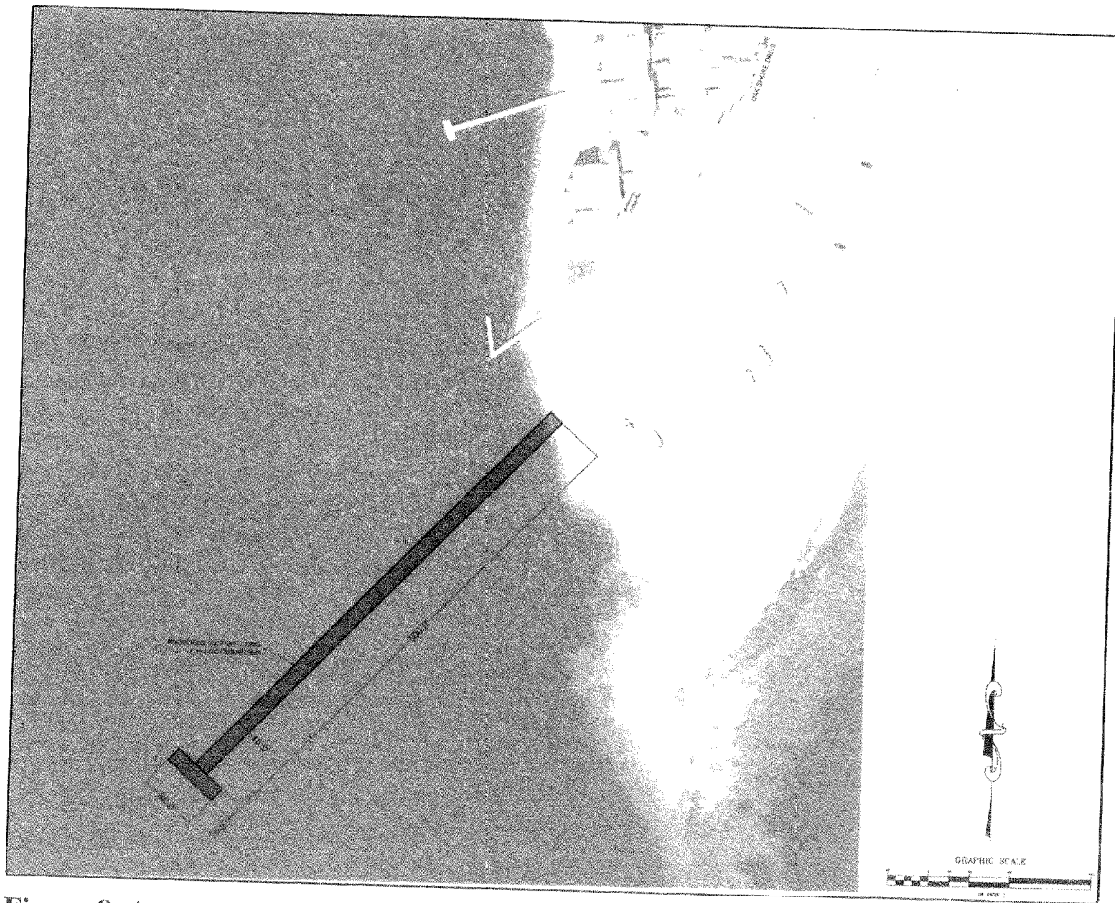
Approximate design location for the proposed Oak Shore Drive Pier. Earl Gilbert dock and ramp is to the north of the proposed pier.
